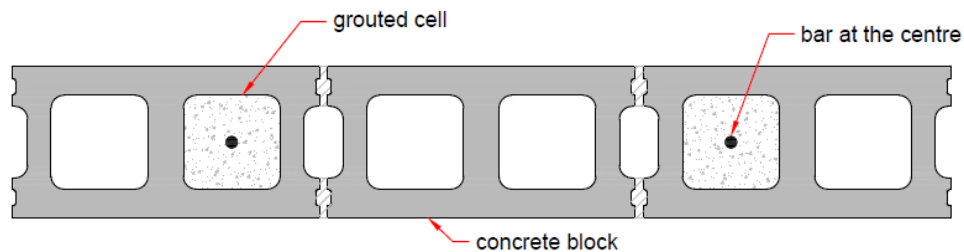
Typical position of the vertical reinforcement in masonry walls construction.
